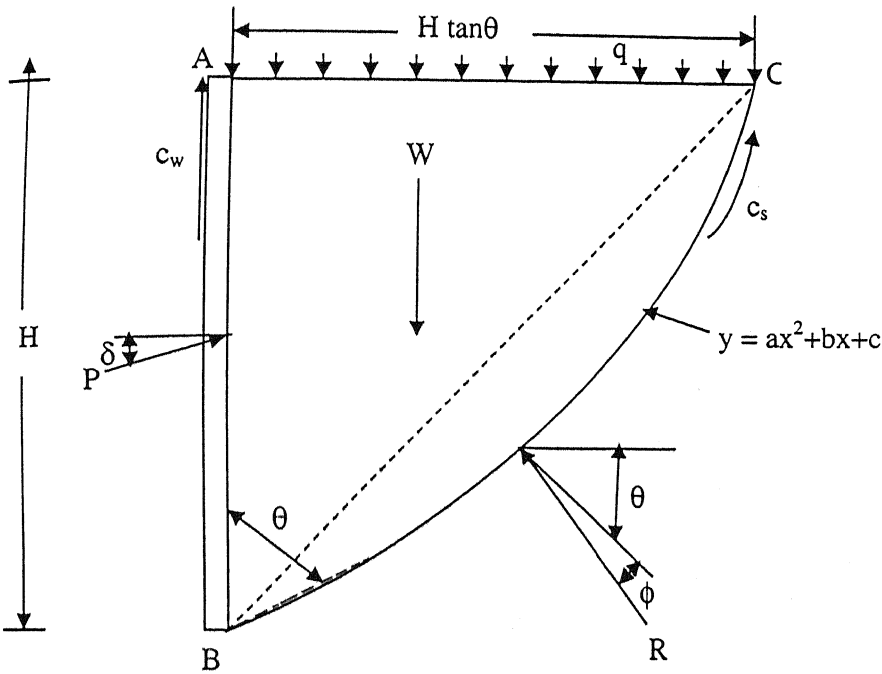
Forces acting on cantilever retaining wall (uniform surcharge, unreinforced backfill)
